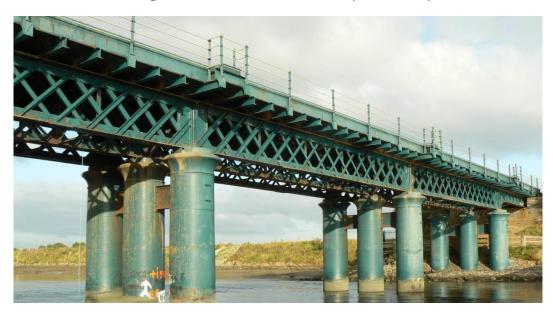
UBB72 bridge elevation (Source: IÉ)
